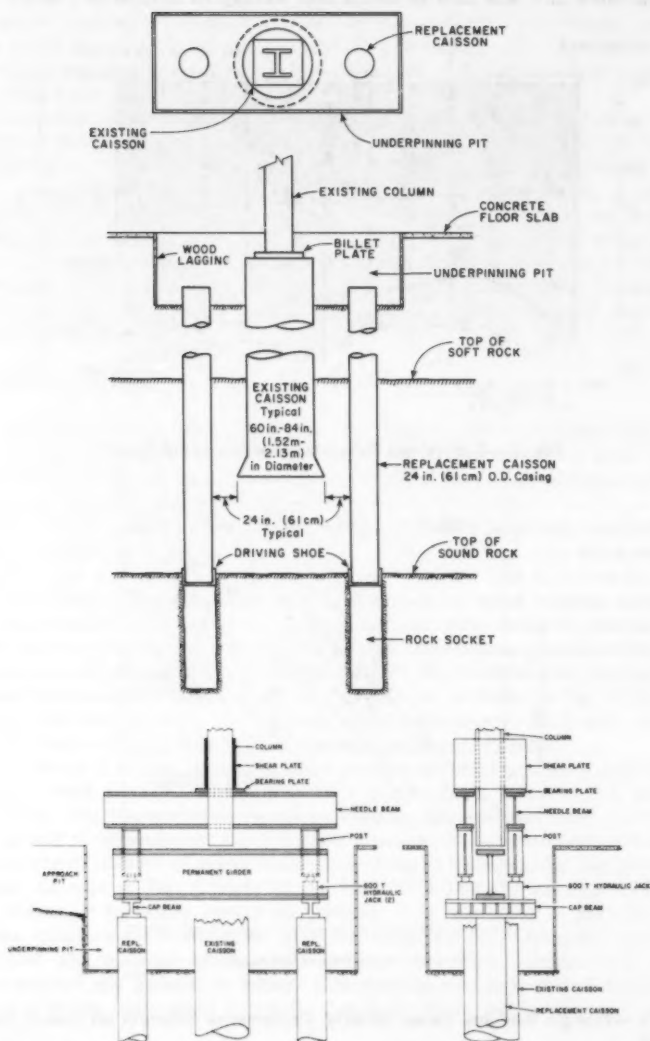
(a) Plan and Elevation of Underpinning System; (b) Load Transfer System
